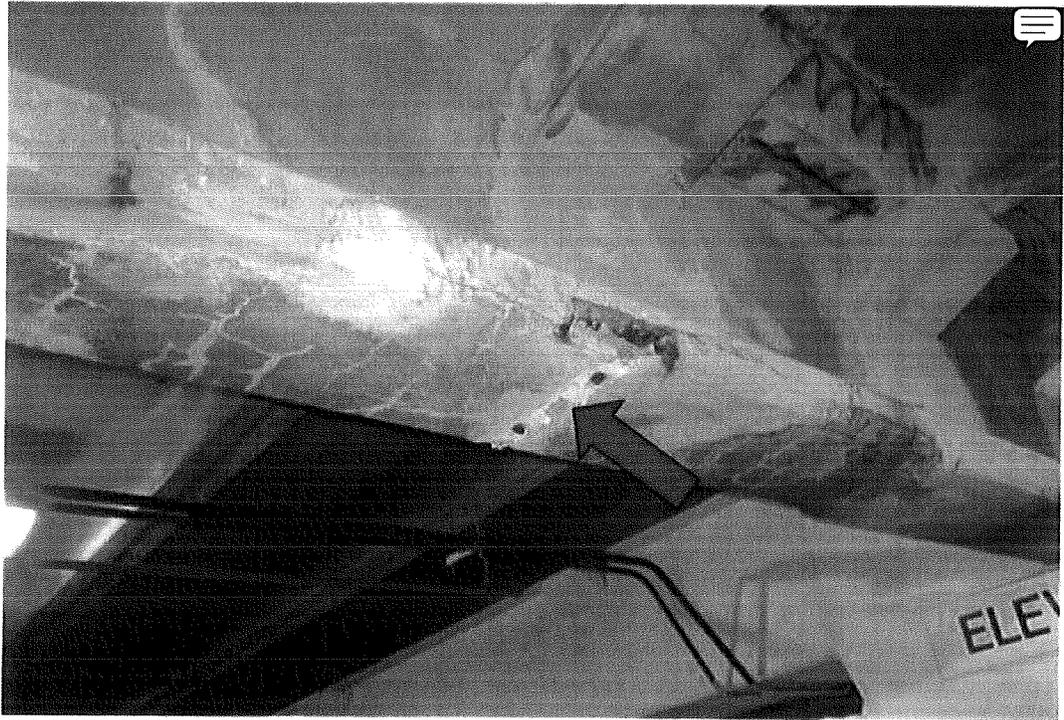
Cracked and hollow sounding encasement. Note the cracks propagating beyond the spalled area. Along Column Line U3, Between Column Lines 23 & 25, underside of Parking Level 7. (Approx. 16 SF)
